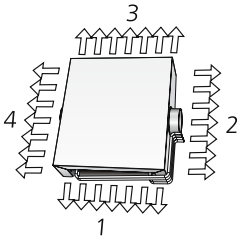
Top view, nozzle setting, ADAPT Parasol EX single-module unit, sides 1-4.
